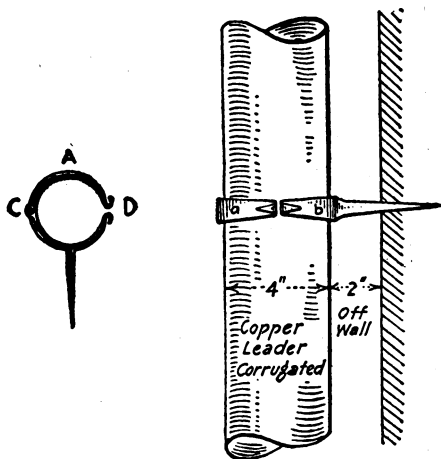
Hinged Cast Bronze Leader Fasteners
